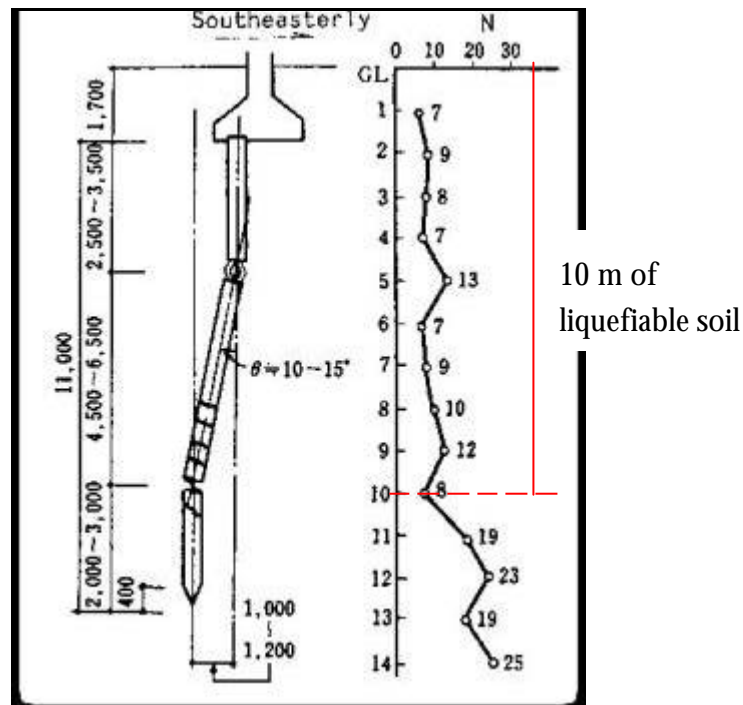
Failed piles of N.H.K building (after Hamada, 1992a).
